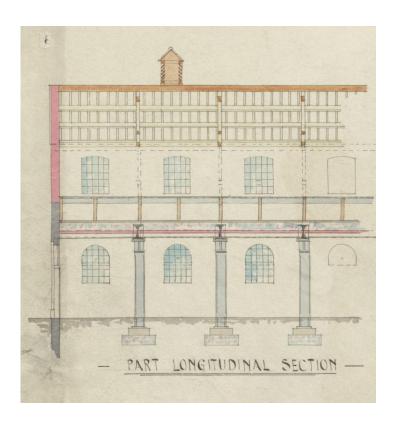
Detail of drawing. Long Stable - Longitudinal Cross Section.
